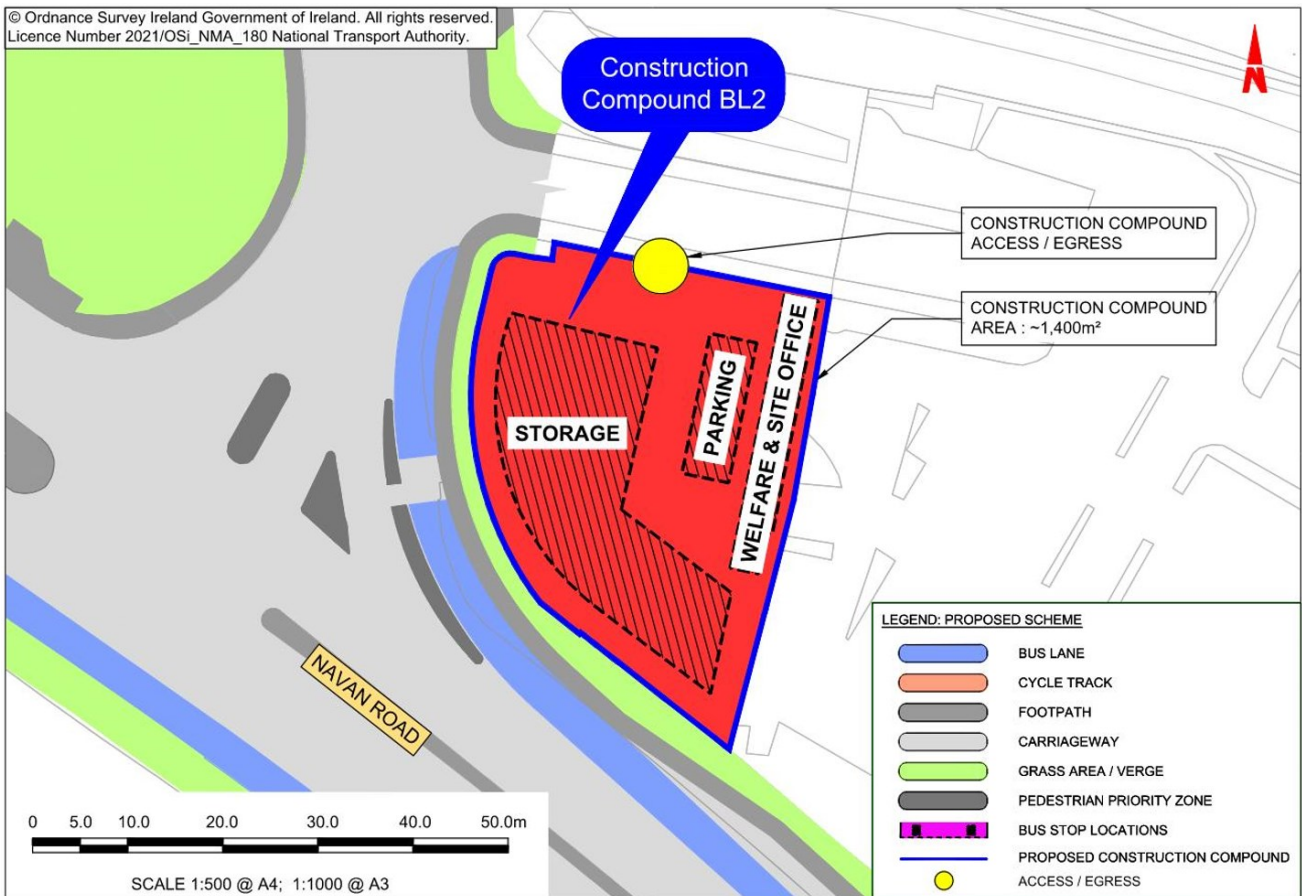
Location, Extent and Layout of Construction Compound BL2
